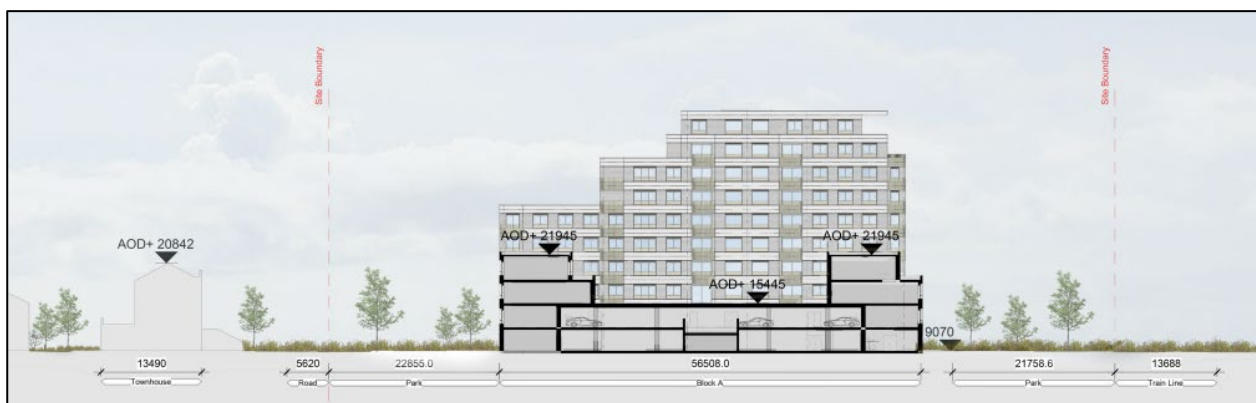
Section of Block A proposal and Shoreside Park to the west
